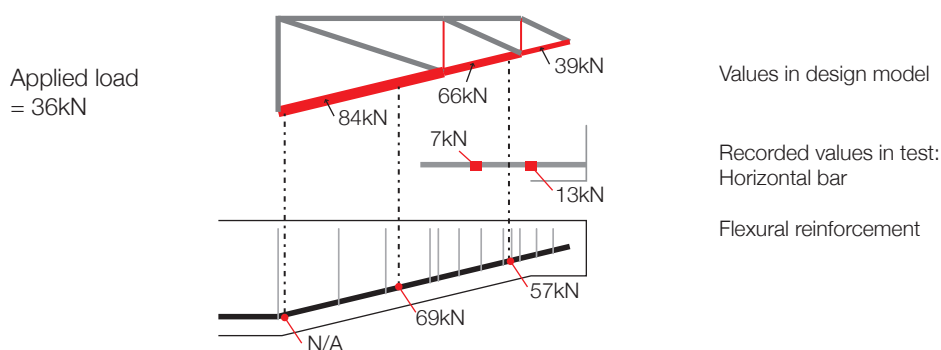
Strut and tie model compared to recorded steel strains at the design load, Beam 9\_2\_STM\_2 (ii).
